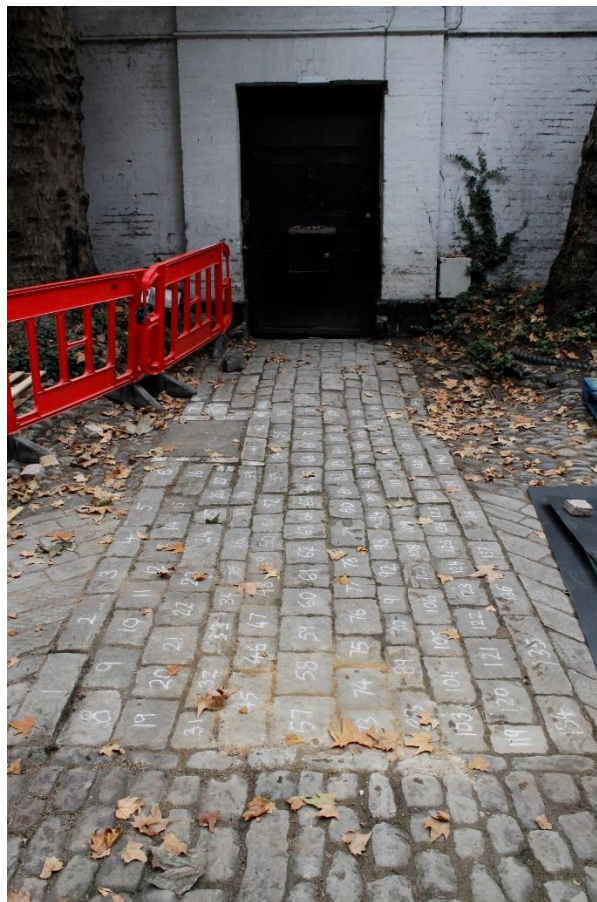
18th-century wall and foundation [167] and cobbled footpath [100], looking east
